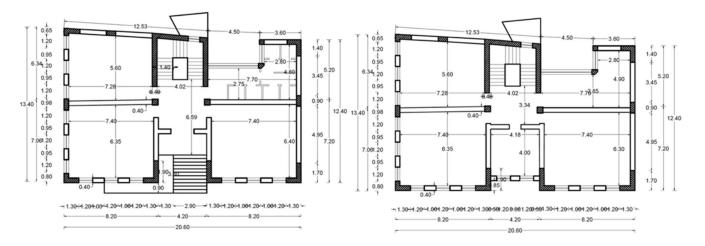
The ground (left) and floor plan (right) of the modern school building (Sefertzio).
